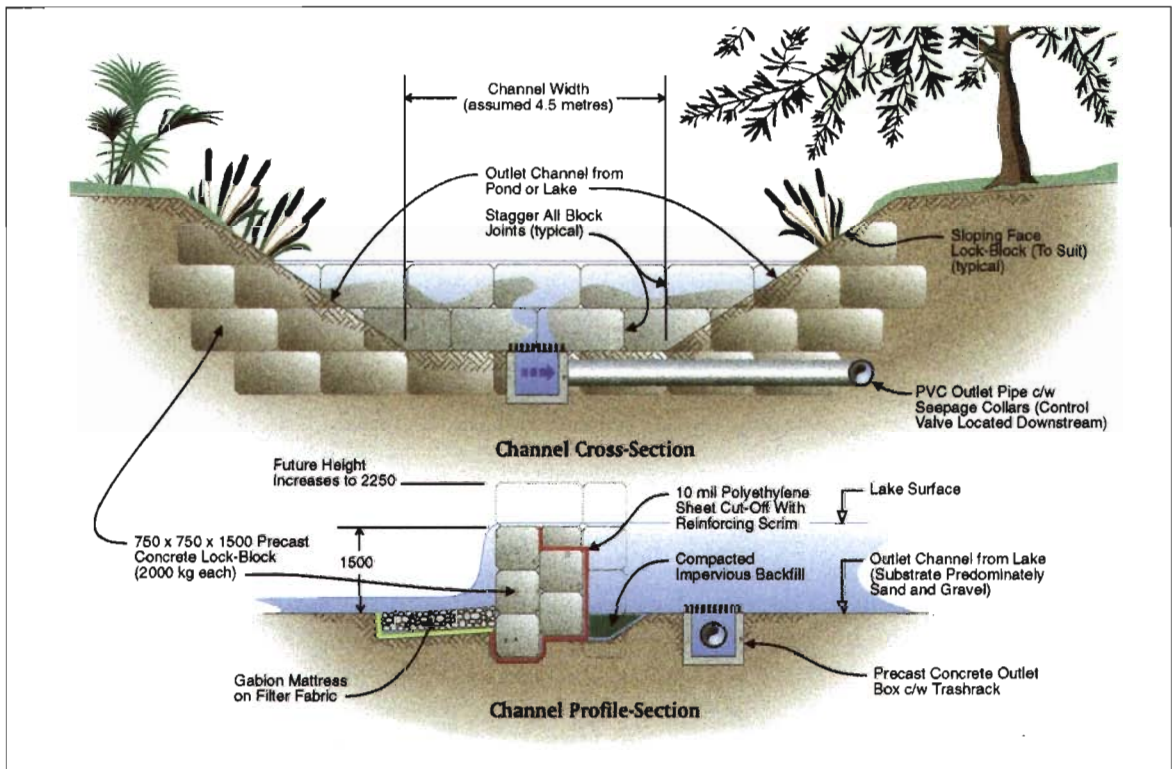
Conceptual design of precast concrete (lock-block) low head dam founded in fluvial deposits.
